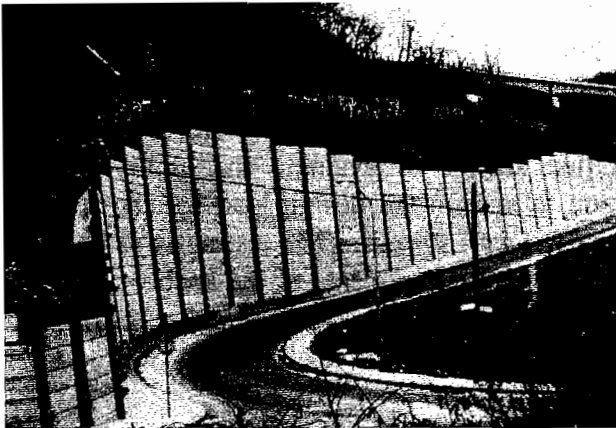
Anchored wall with precast concrete lagging (ground anchors connected at soldier piles)
